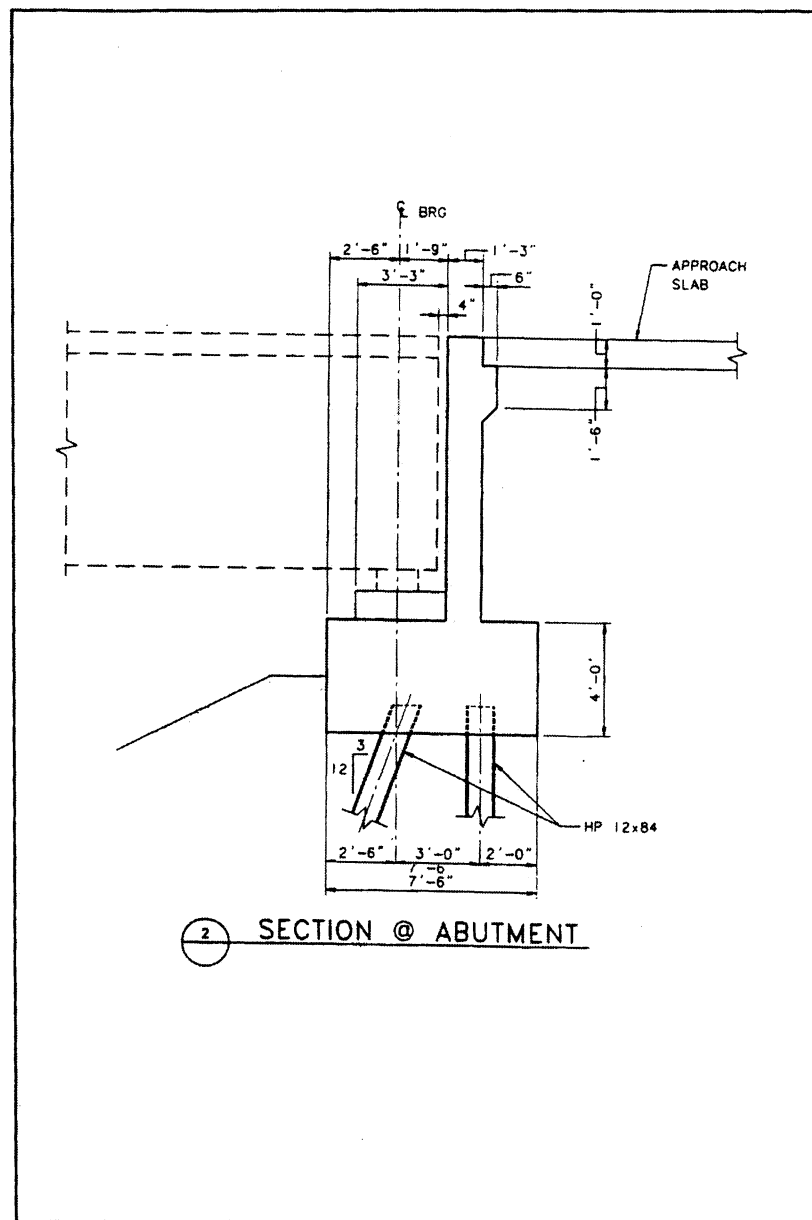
Bridge No. 5 – Seat Type Abutment
